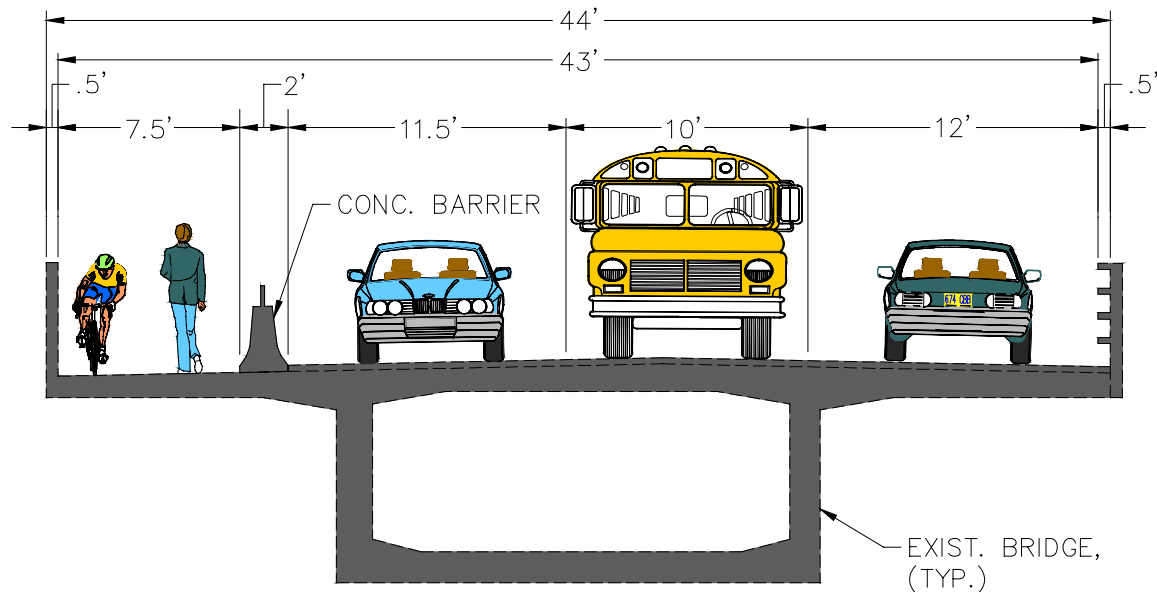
Proposed Typical Section for Reversible Lane Bridge
